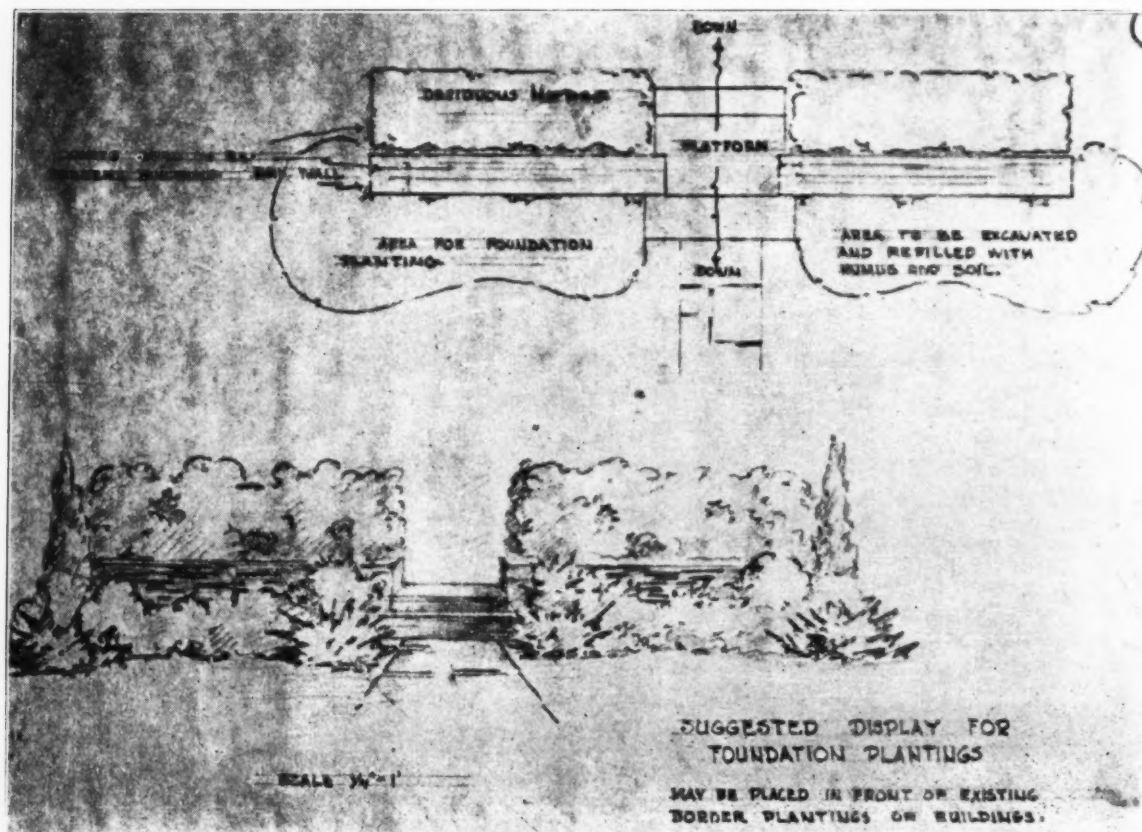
Here is a clever arrangement to suggest a foundation planting. The hedge and wall are to represent a building. The drawing is from the plan of Julian Schmitz, Watertown, Conn.
